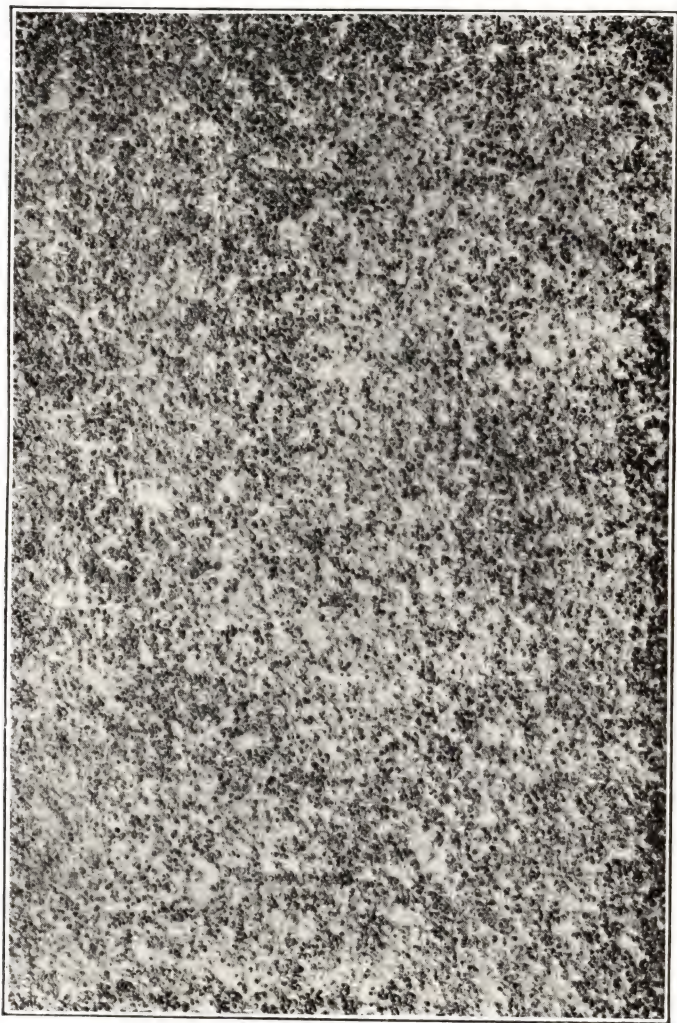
An Interesting Wall Finish Produced with a Spray Gun and Plastic Paint.
